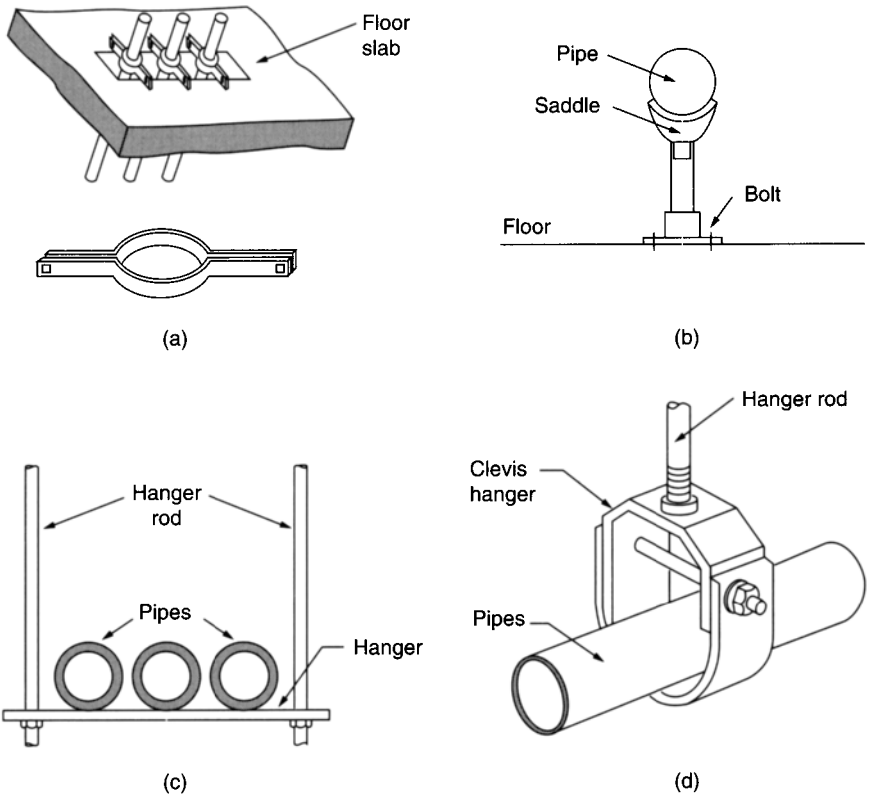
Typical pipe hanger types. (a) Pipe clamp; (b) adjustable saddle; (c) trapeze hanger; (d) adjustable clevis hanger.
